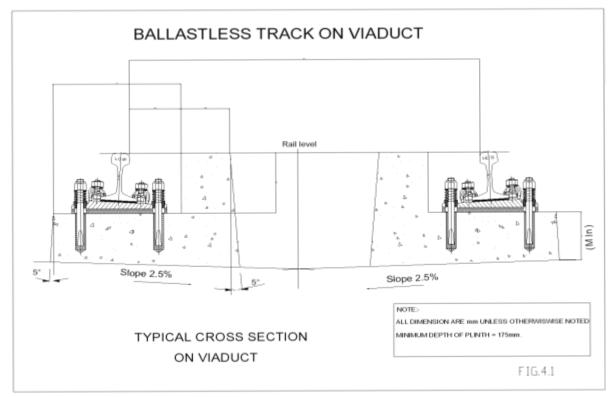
Typical Cross Section of the Ballast less Track on Viaduct
